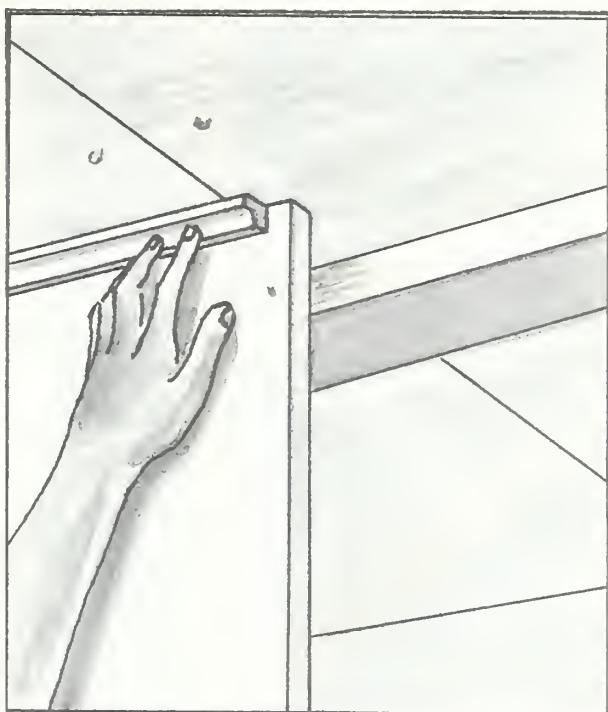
Curtain-wall partition is blocked away from the ceiling with no solid timber close to the ceiling for fastening of moldings.
